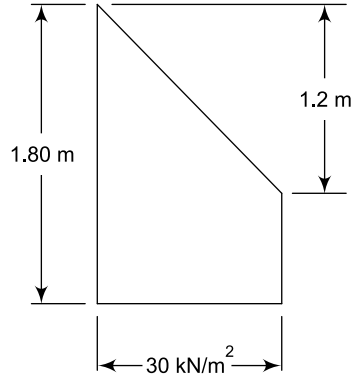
Pressure Distribution Diagram for Foundation Wall.
